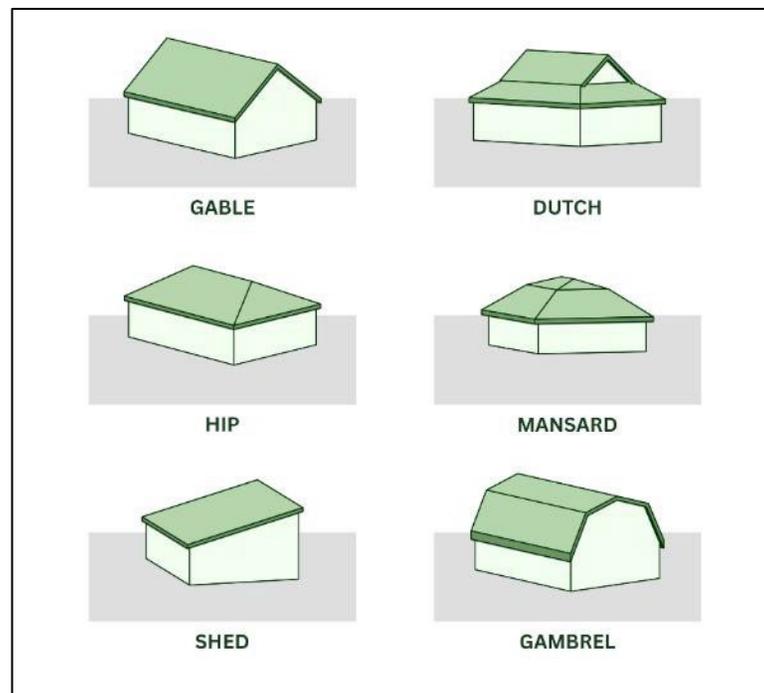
COMMON ROOF FORMS FOUND IN HISTORIC DISTRICTS
